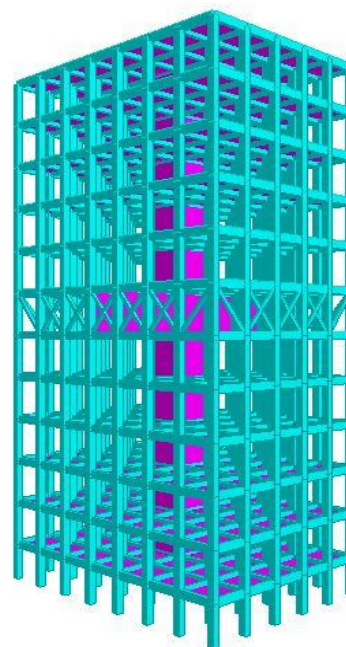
Actual 3D view of case (RA7-OTB) Residential Apartment with Shear core outrigger and optimized truss belt supported system B
